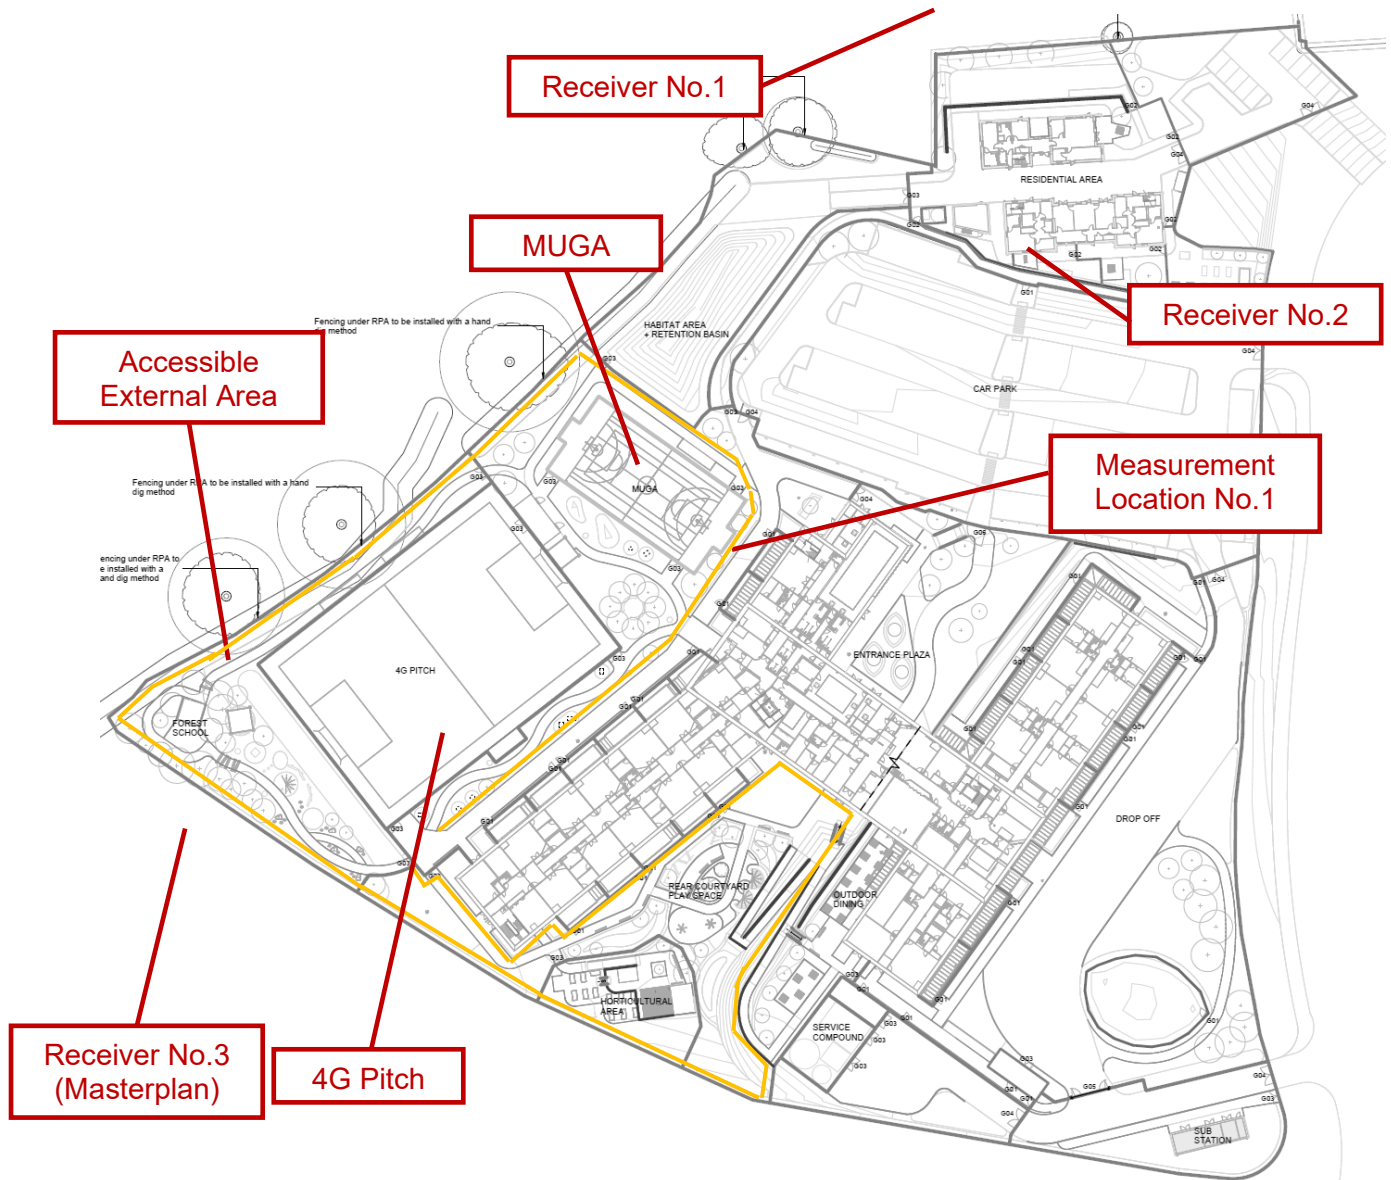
SITE PLAN SHOWING SCHOOL, EXTERNAL PLAY AREAS, MUGA, 4G PITCH AND NEIGHBOURING NOISE SENSITIVE RECEIVERS
